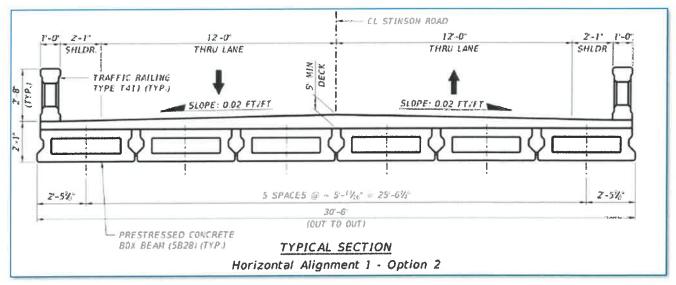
TxDOT Prestressed Concrete Box Beams (5B20) Typical Section
